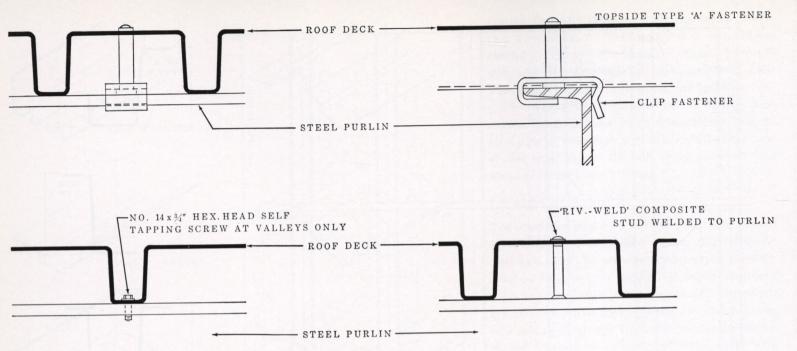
Typical cross-sections showing alternate fastening methods.
